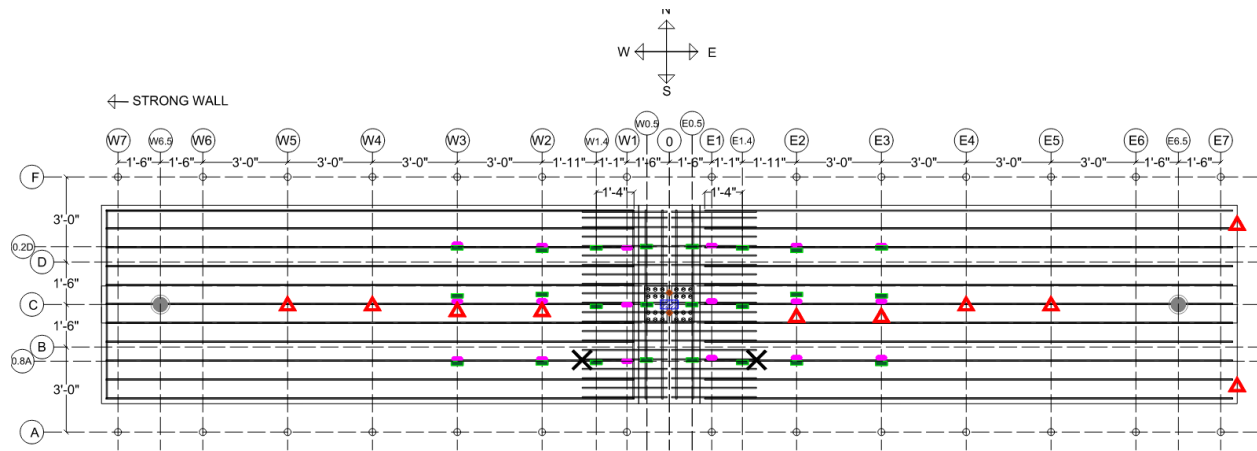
Concept A Instrumentation Plan (Plan View).
